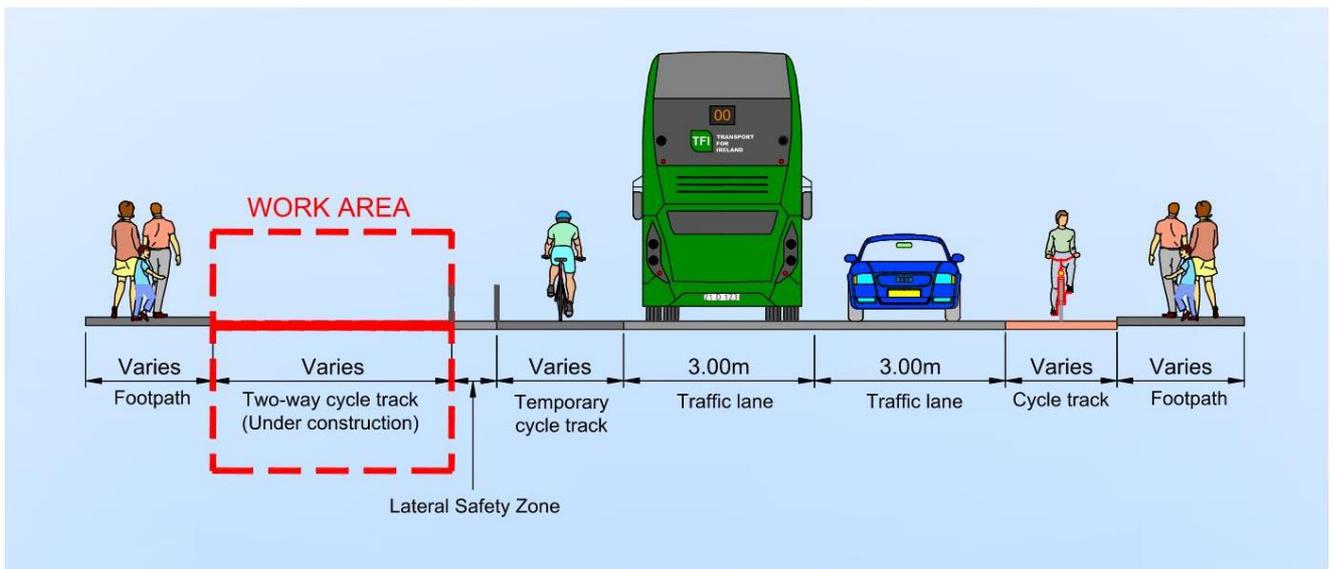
Traffic Management Cross Section, Section 4a – Stage 1
